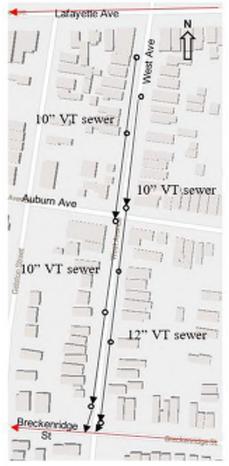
Existing Conditions: West at Breckenridge and Lafayette
